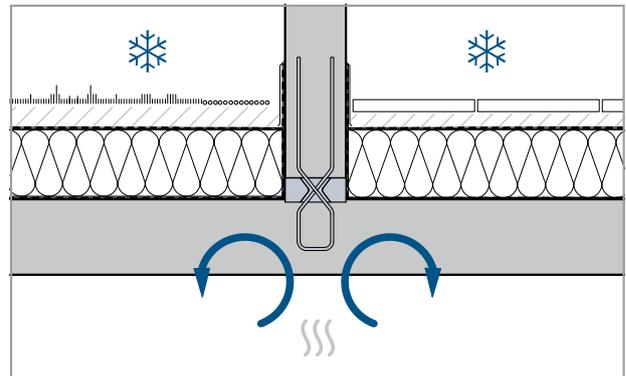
Pos. ③: Heat flow in roof construction with Schöck Sconnex® type W
